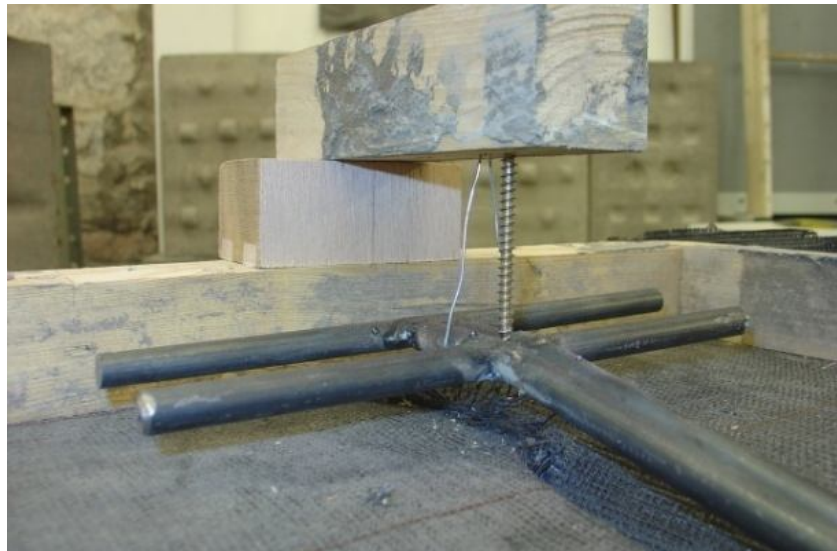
Use of timber blocks to support reinforcement at anchorage
